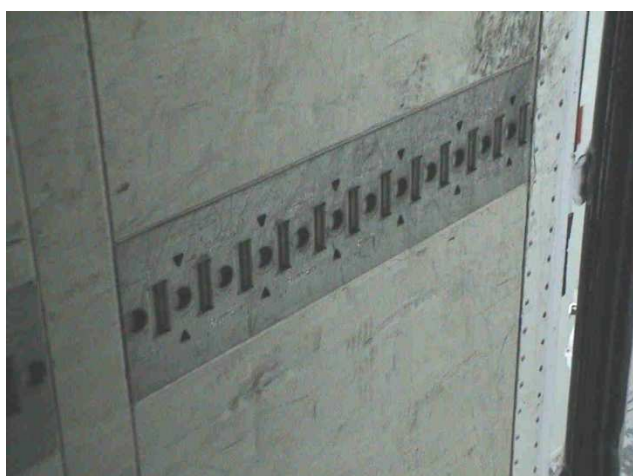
Strengthening for the load protecting system sunk in the wall [1]
